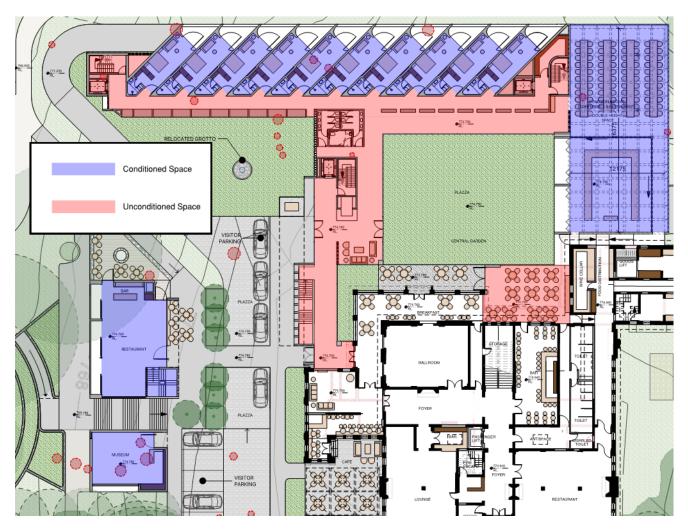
Level 4 New Modern Wing, Function Room, Restaurant and Museum layout
